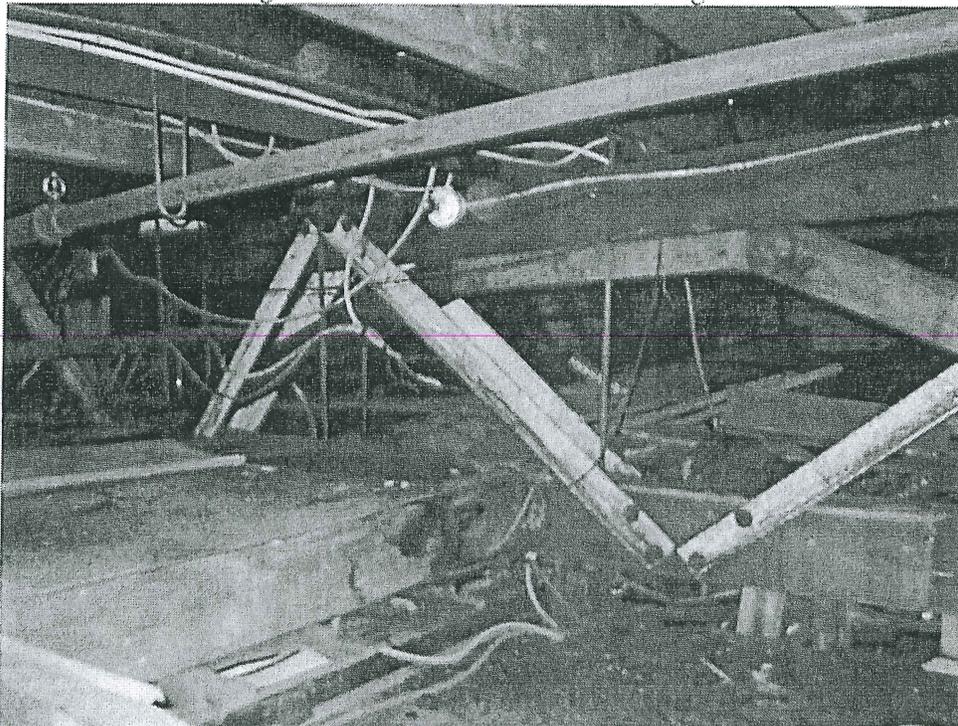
Roof framing at the north end of the Reid and Hughes Building, looking west
